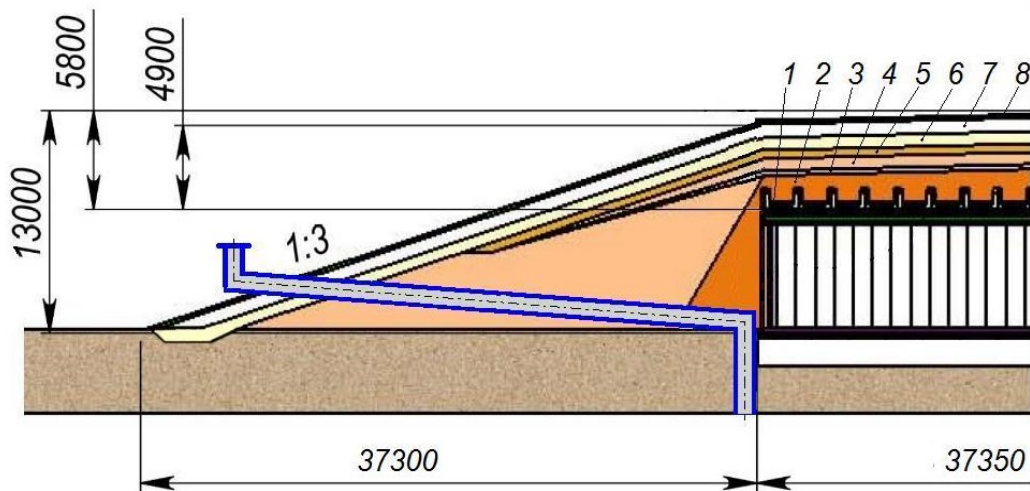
Composition (cross-section) of the 5.8 m thick engineered barrier after transformation of the storage facility (bld. 158) into a repository: (1) drainage layer; (2) insulating clay layer; (3) drainage layer; (4) protective clay layer; (5–7) drainage layers; (8) vegetation layer)
